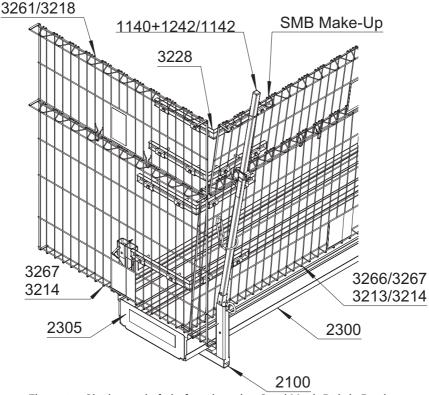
Closing end of platform by using Steel Mesh Debris Barriers Lightweight, Make-Ups and SMBL Angle Consoles 3258
